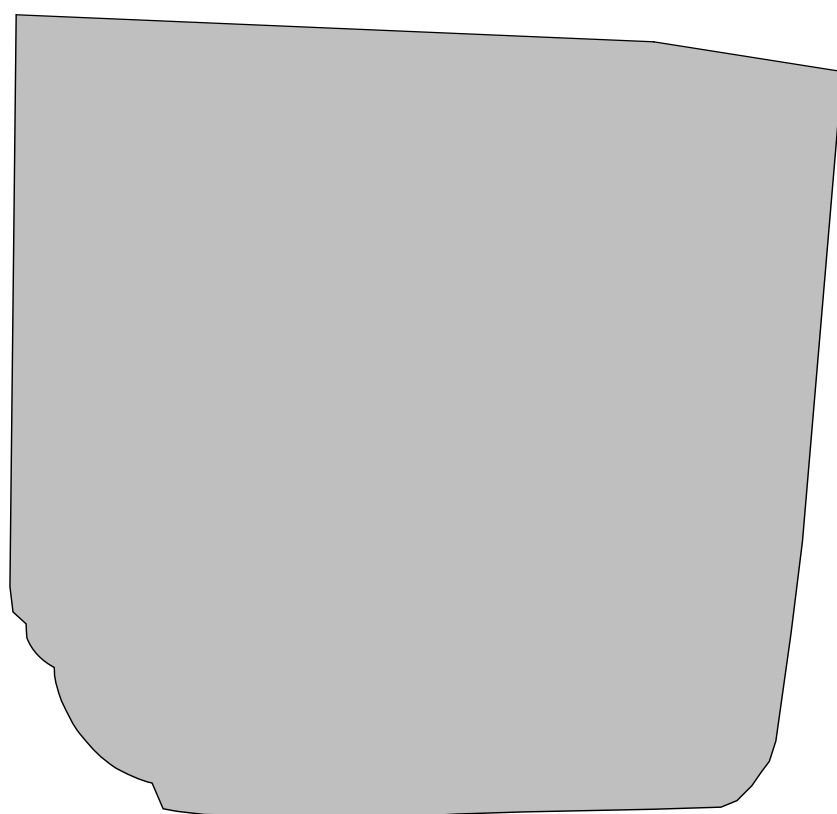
Profile of girding beam in rear wall frame of number 1. Scale 1:2
